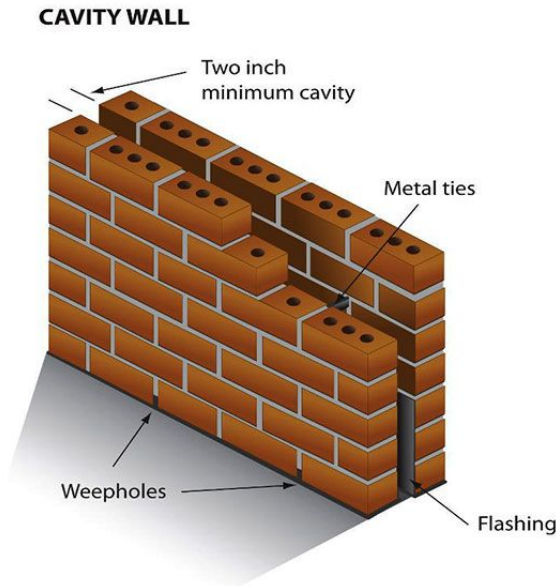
cavity wall with metal ties- double-wythe masonry wall [36]
